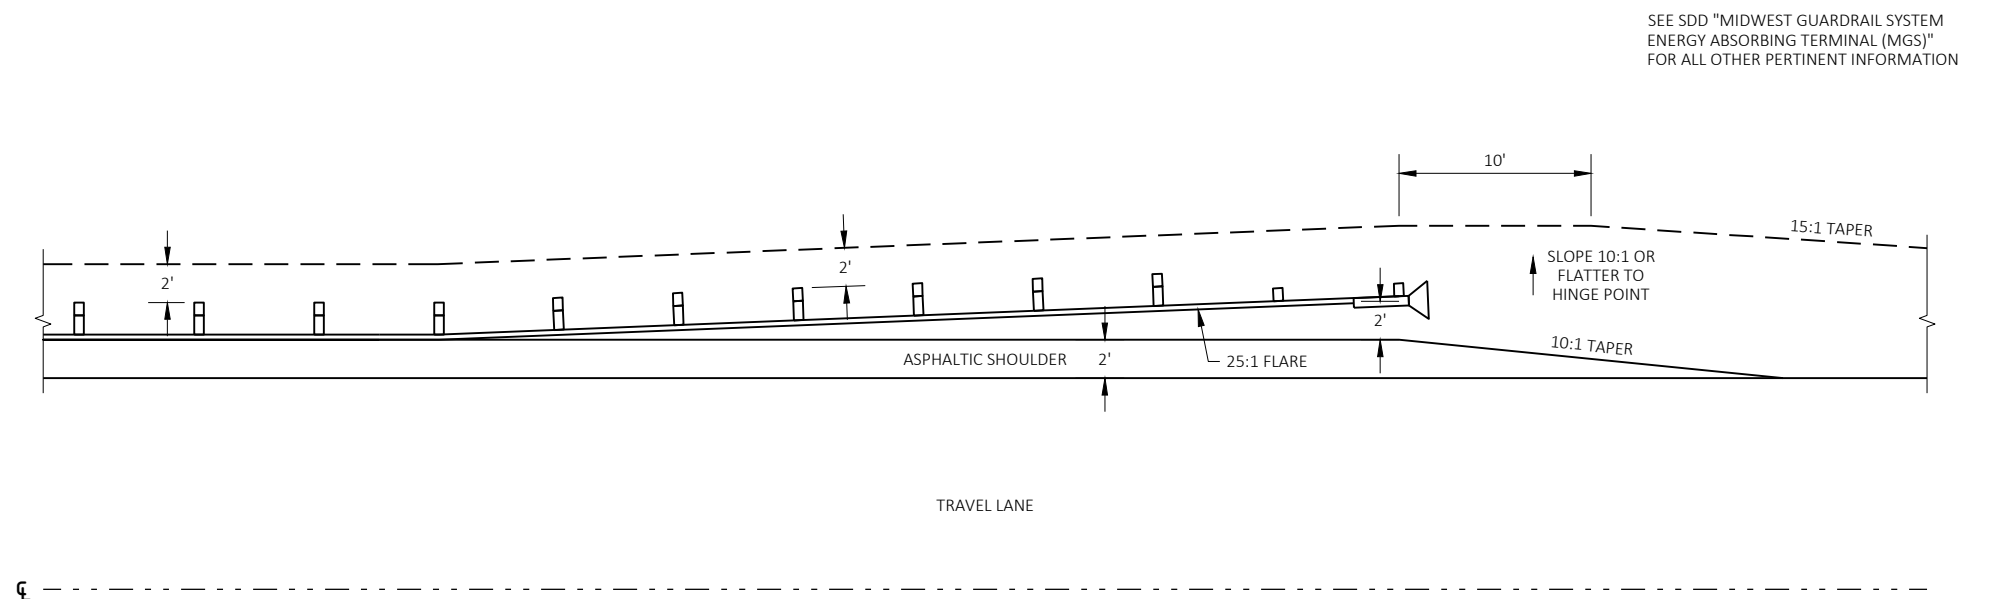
DETAIL FOR ASPHALTIC SHOULDER AT GUARDRAIL
